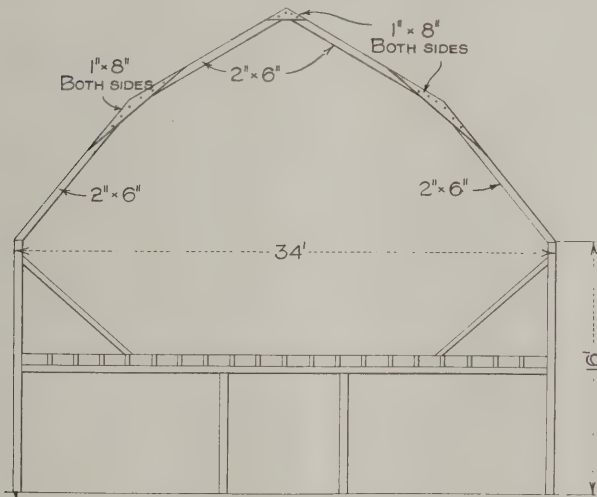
A Method of Roof Framing Which One Builder Designates as "Self-Supporting"
